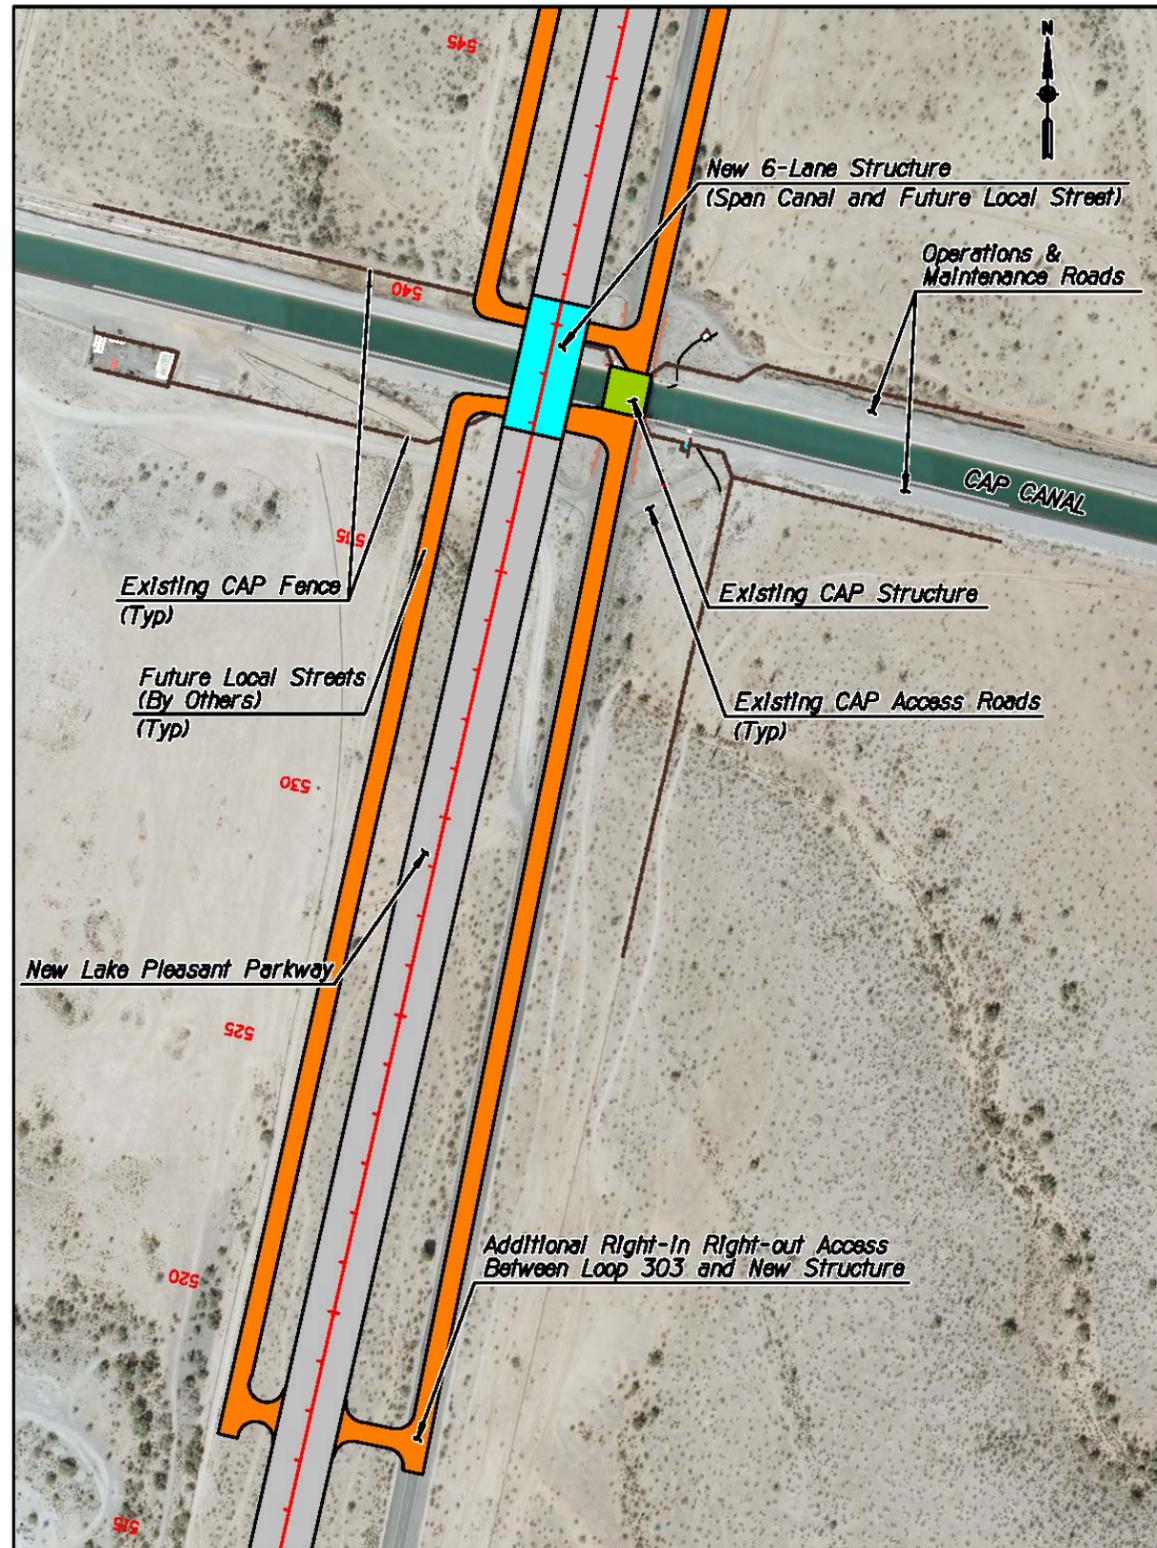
CAP Alternative 2: Access on Existing Roadway
